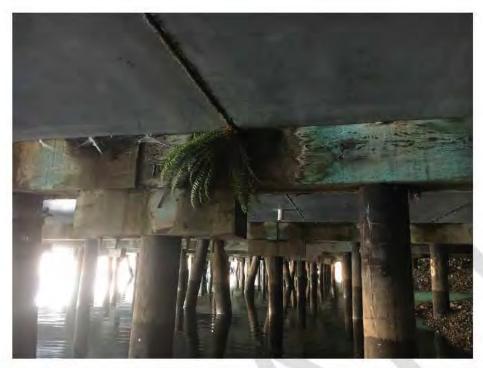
Multiple notches on pile cap at Bent No. 21
